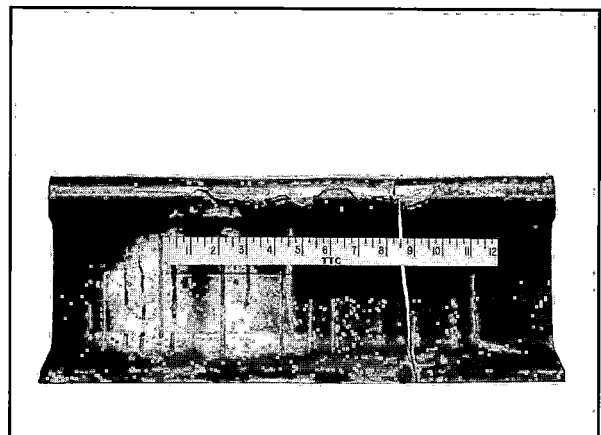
Shelling of Standard 300 Bhn Ingot Cast Rail under FAST HAL Testing
